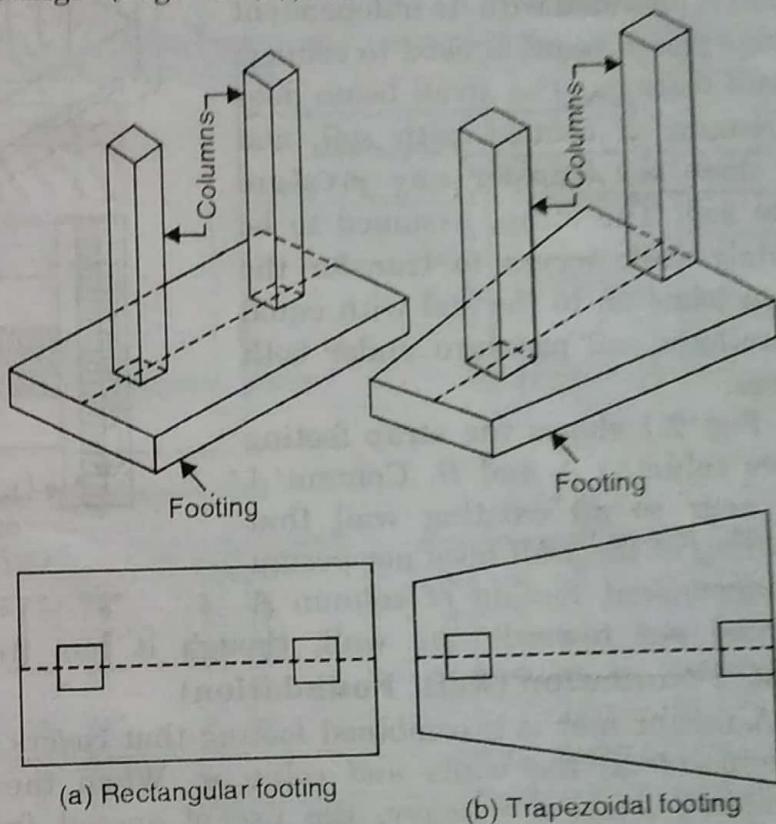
COMBINED FOOTINGS FOR COLUMNS.
